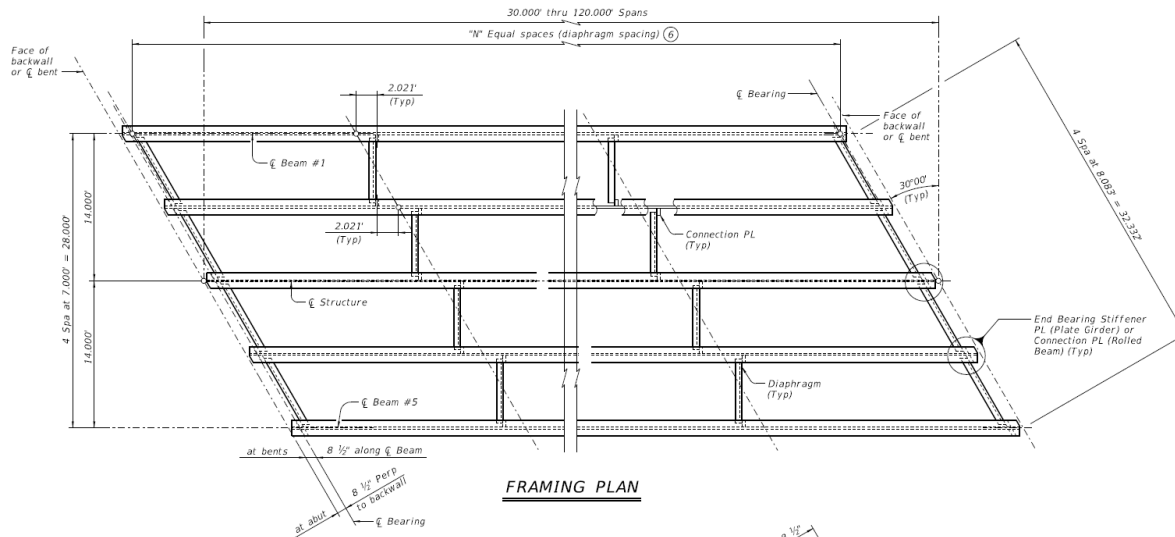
TxDOT Standard Design Framing Plan for a 30-ft Roadway with a 30-Degree Skew Angle [25].
